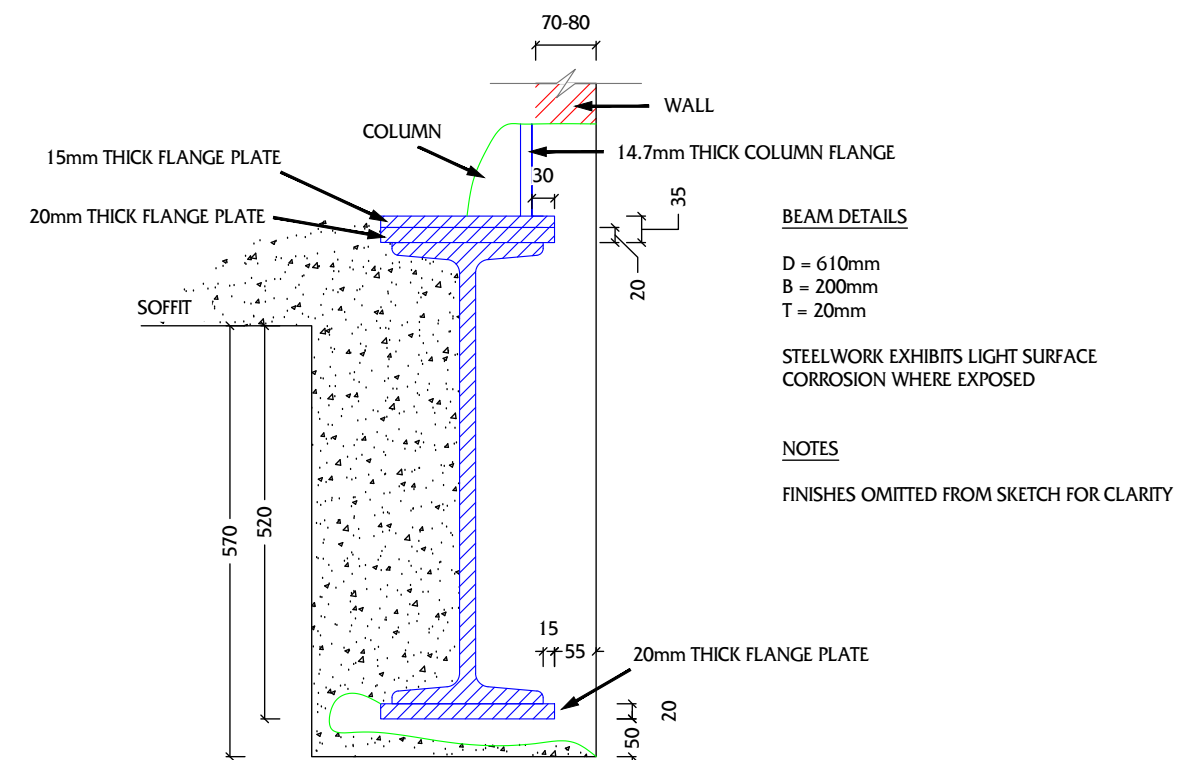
PART ELEVATION LOOKING WEST TOWARDS TRANSFER BEAM - SURVEY AREA K3 SCALE 1:10
